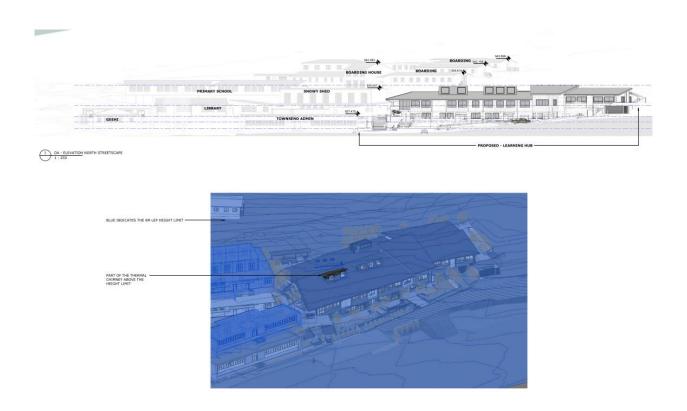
Elevations and perspectives of the new learning building in context with the existing school
